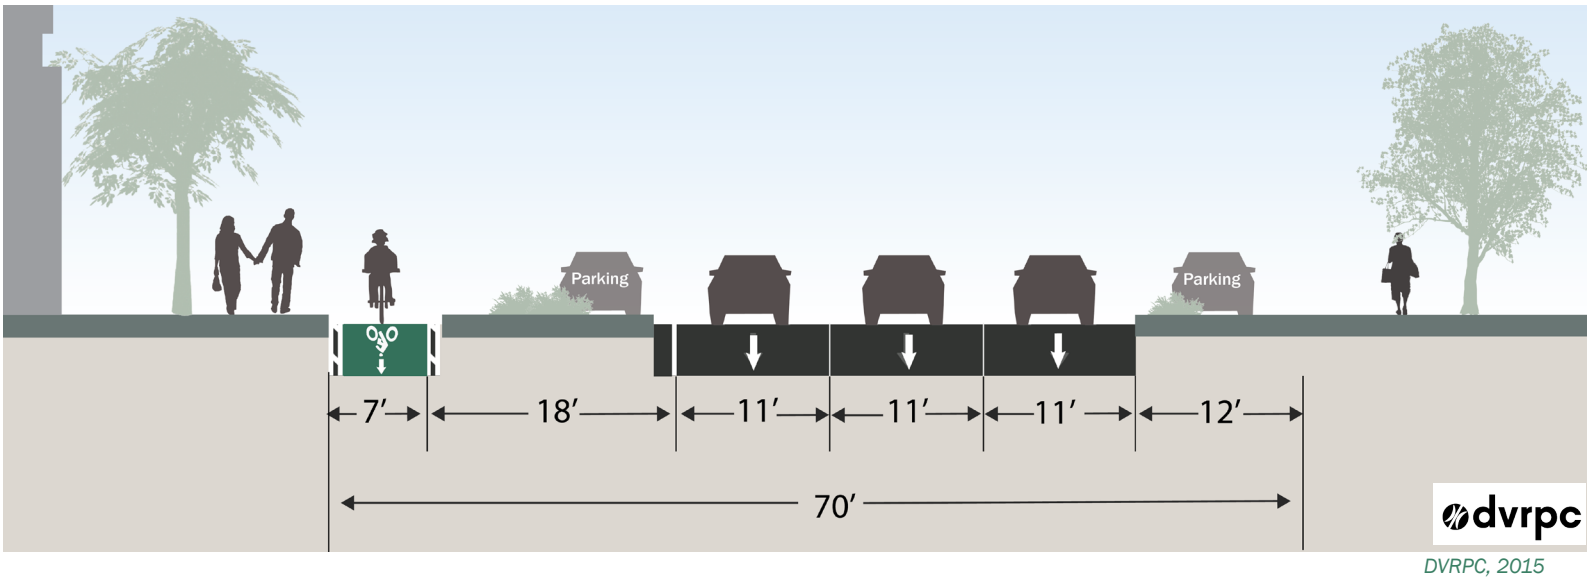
Proposed Design–Race at 7th Street looking west with new conceptual building development
